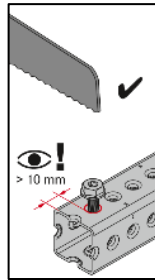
Installation instructions for Hilti MT-TFB OC thread forming bolts
